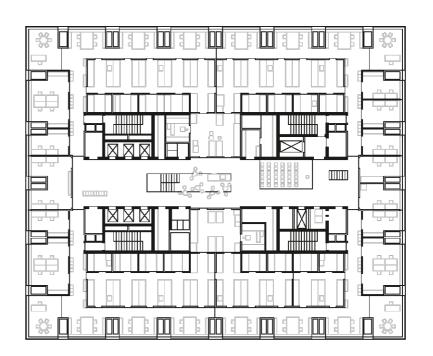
| Standard Floor | Floor plan | Scale 1:500
